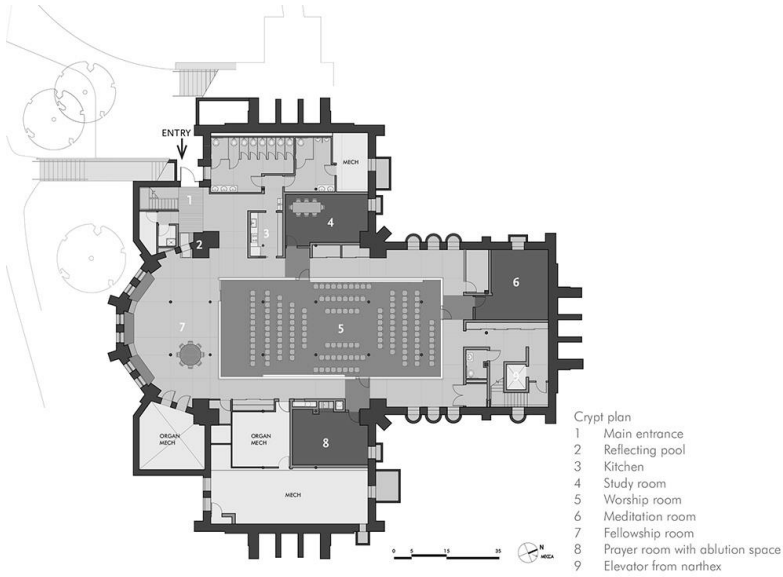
Houghton Chapel's New Plan as a Multi-Faith Center.
